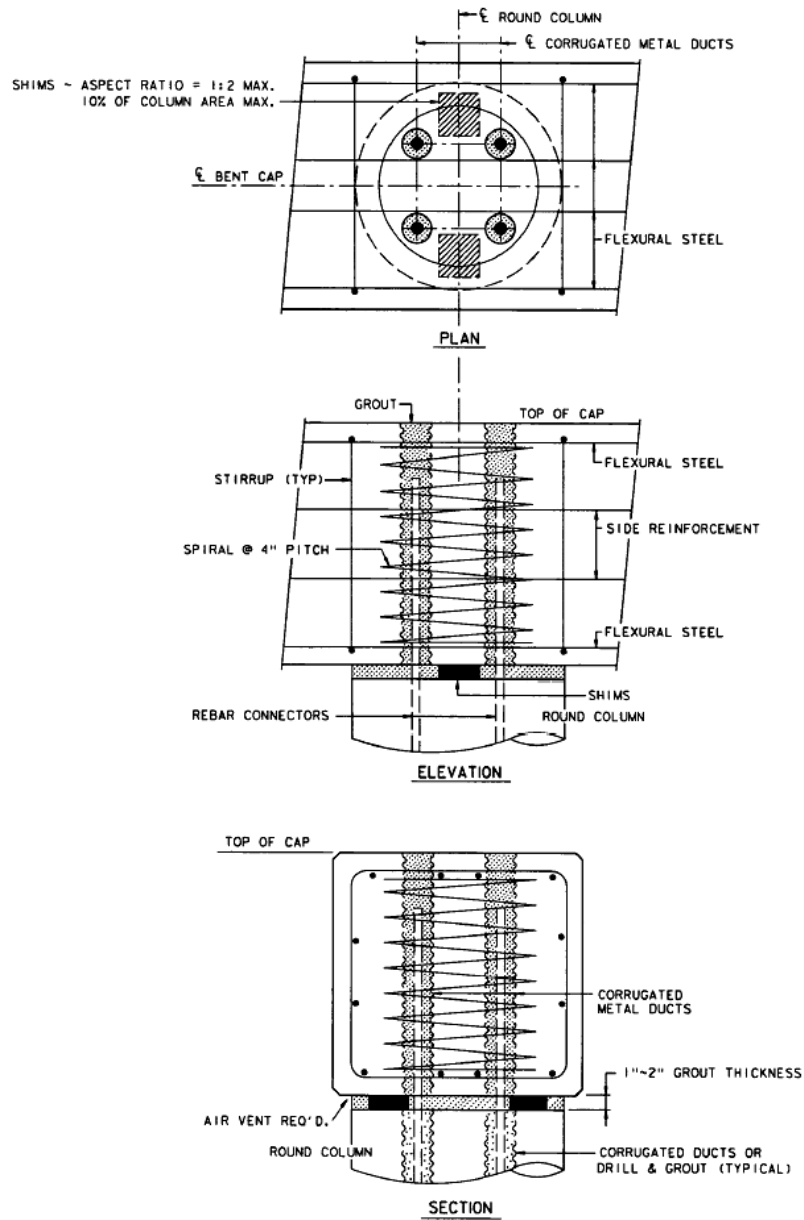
Connection Detail for Grouted Vertical Ducts on Column (Surface-flush Option) (Matsumoto et al. 2001)
